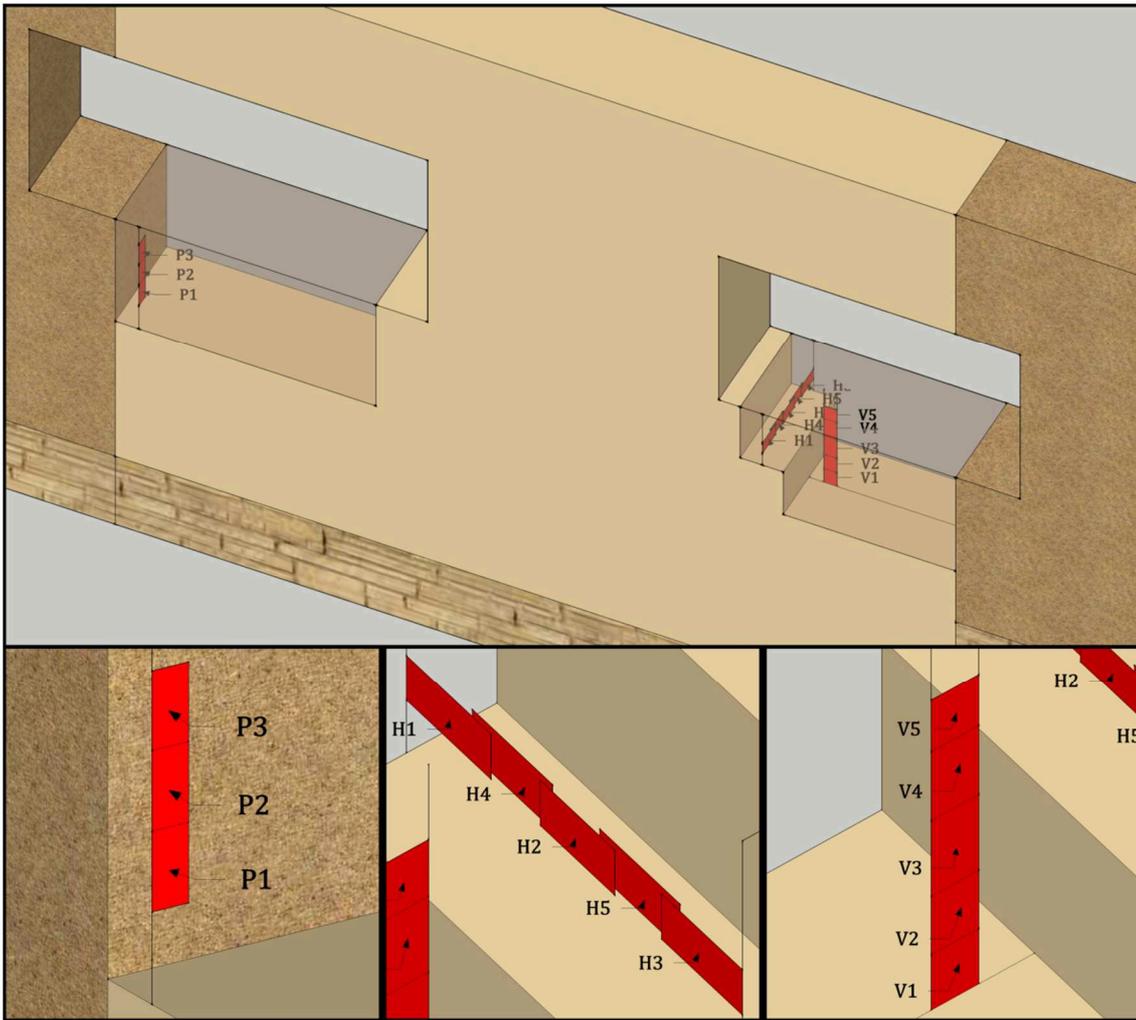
Arrangement of thin sections specimens for plaster cross-section (P), horizontal cross-section (H) and vertical cross-section (V)
